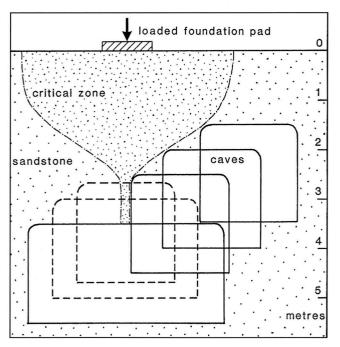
Cross section showing caves in Nottingham's sandstone, which are acceptable below a foundation pad. Sound rock has to be proven within the critical zone to avoid the threat of a punching failure, except where the caves shown with broken lines are stable due to their modest widths. Caves wider than 4 metres are uncommon, and may require a greater cover to ensure stability.
